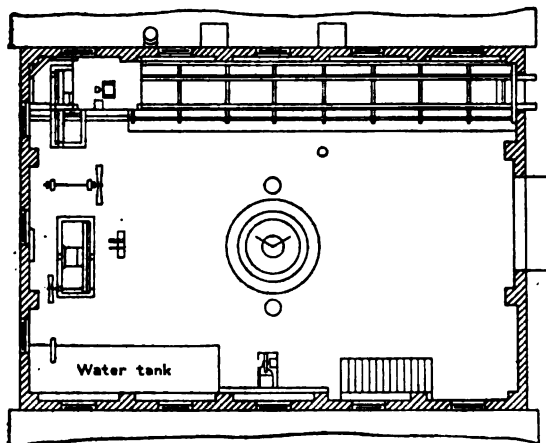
Plan of furnace house at Trollhättan, Sweden.
